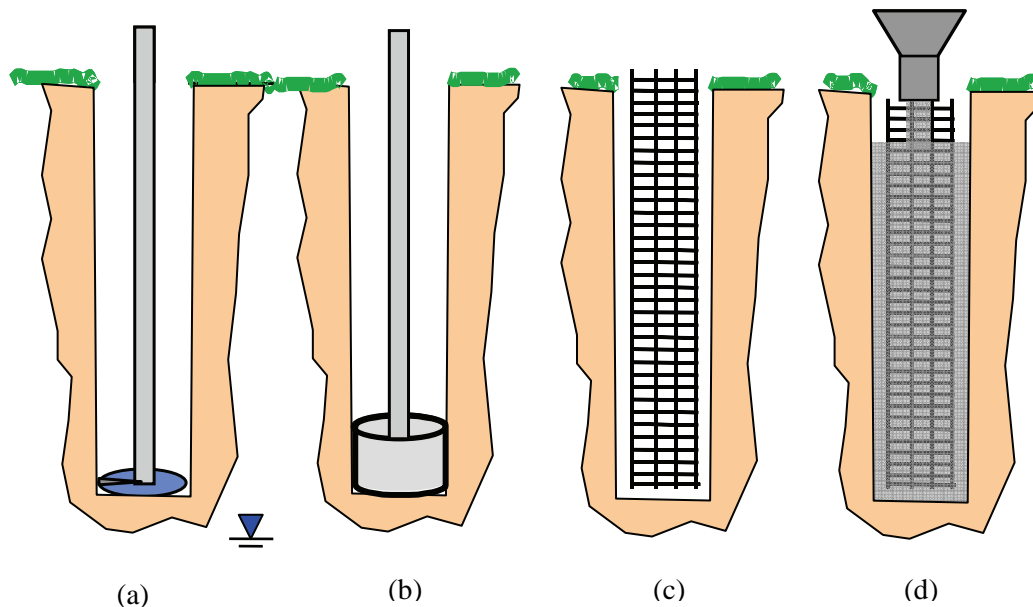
Dry Method of Construction: (a) Drill the Hole; (b) Clean the Base; (c) Place Reinforcement; (d) Place Concrete
